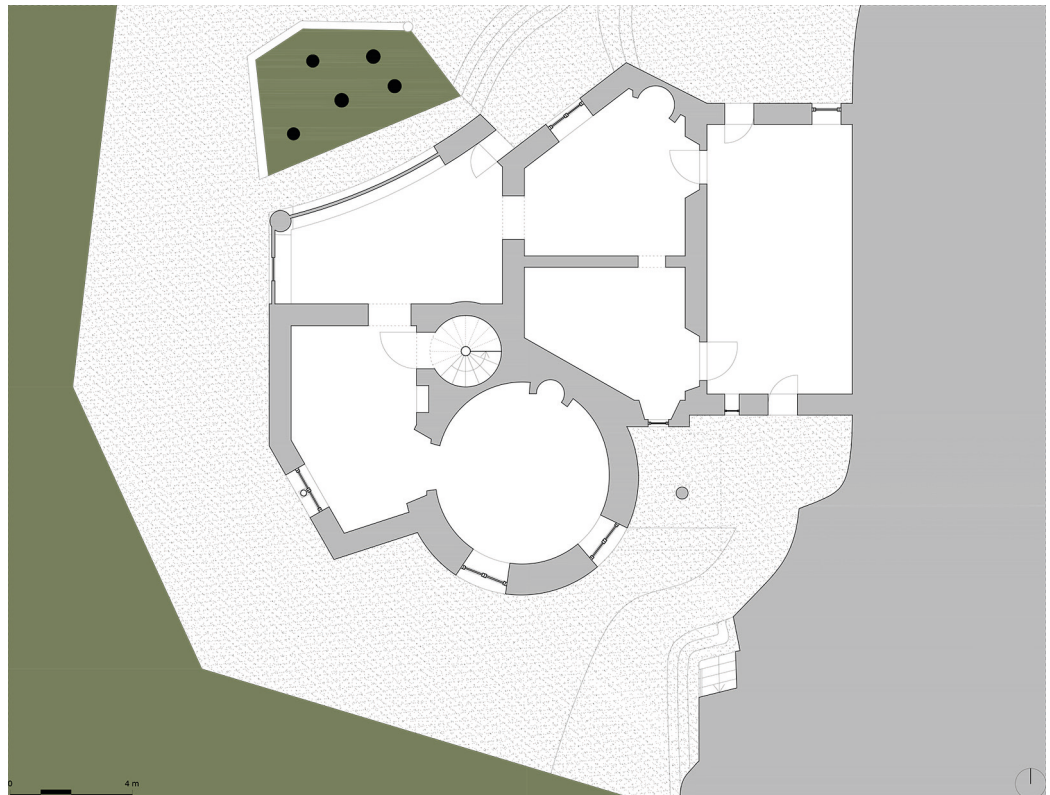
Quinta de Amizade. Ground floor plan of the main residence.
